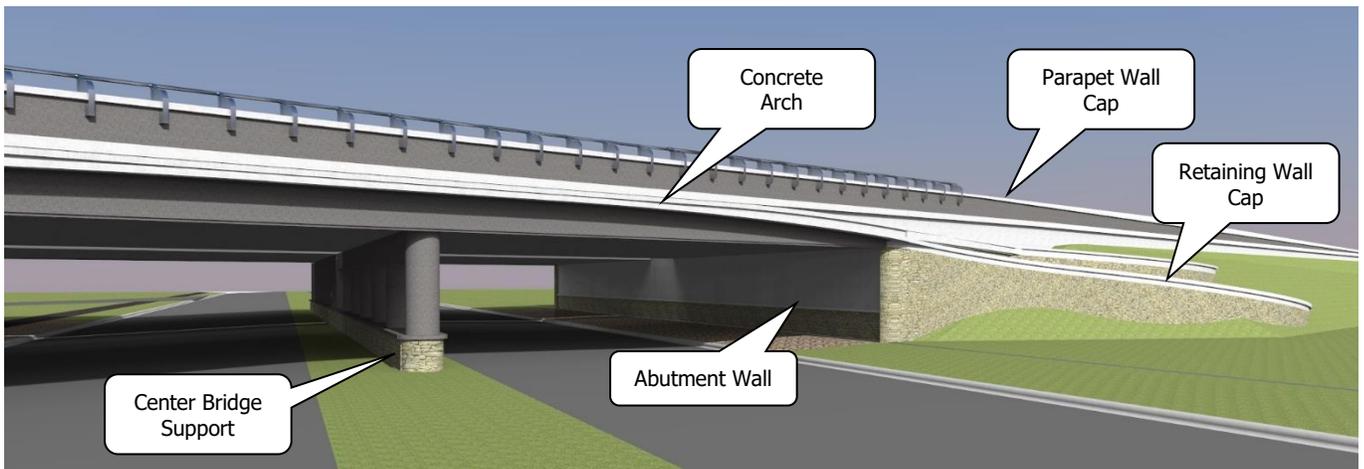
US 33 over SR 161 Bridge Rendering – Oblique View
